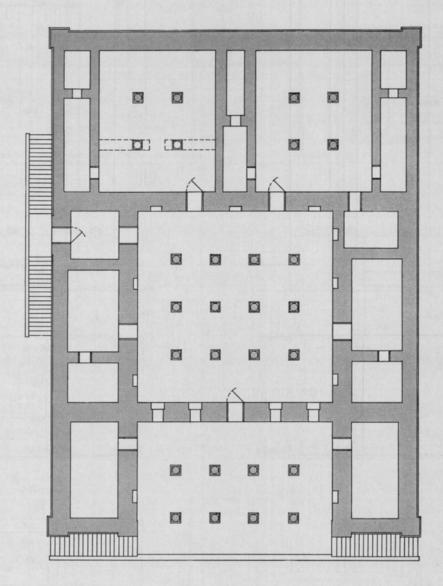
Reconstructed Plan of Palace of Darius. Scale, 1:300
